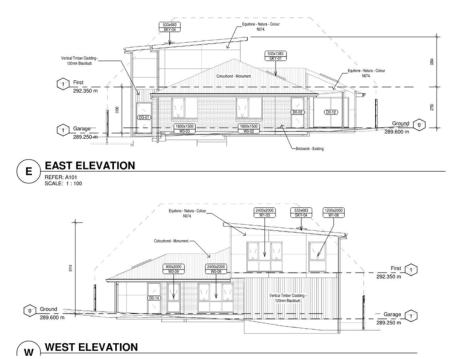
Excerpt from submitted proposed east and west elevation plans. Note the building envelope shown is incorrect - refer Assessment and Discussion sections for explanation (Source: Formation Design & Drafting).
